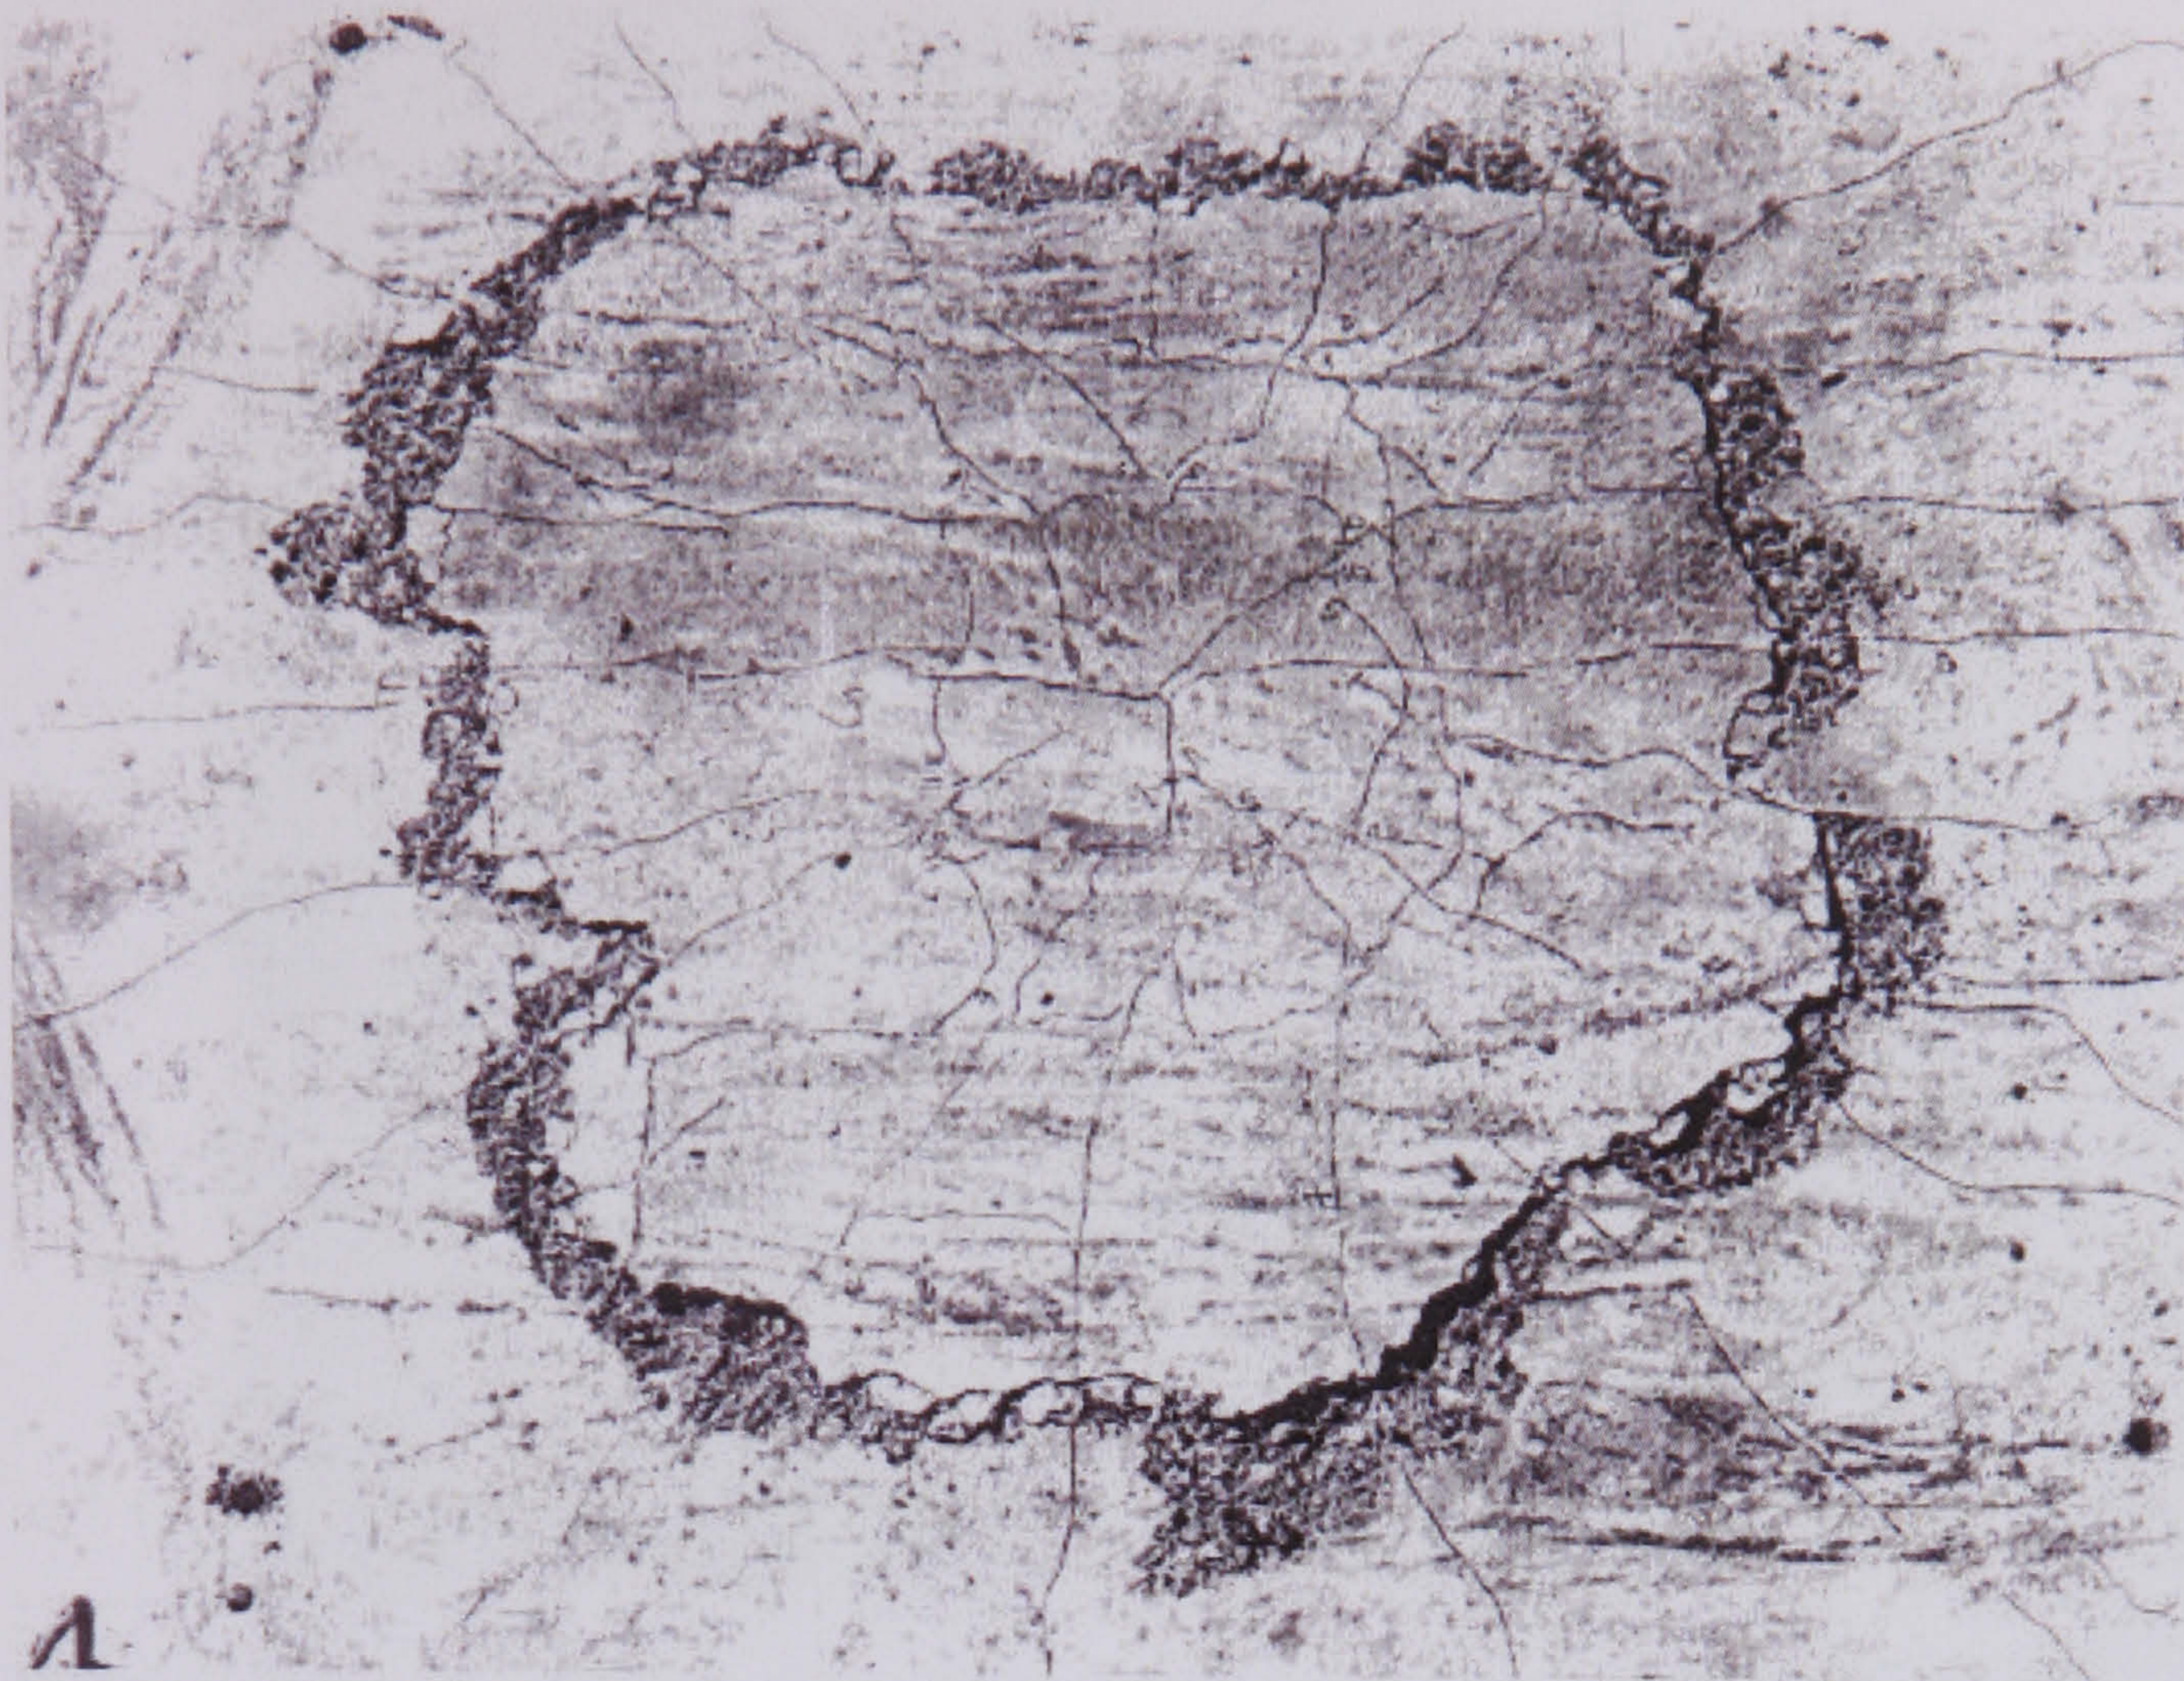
Punching shear failure of reinforced concrete slab-column connection due to axial column load [34]
